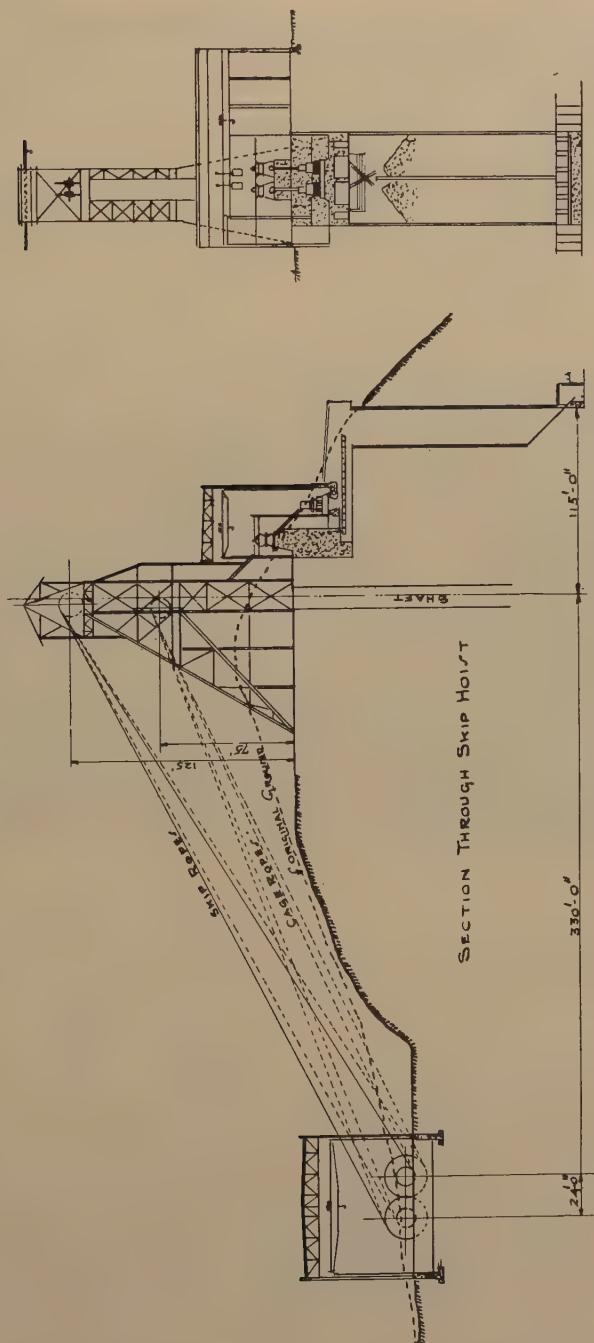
SURFACE PLANT IN PLAN AND ELEVATION, ROSS SHAFT.
